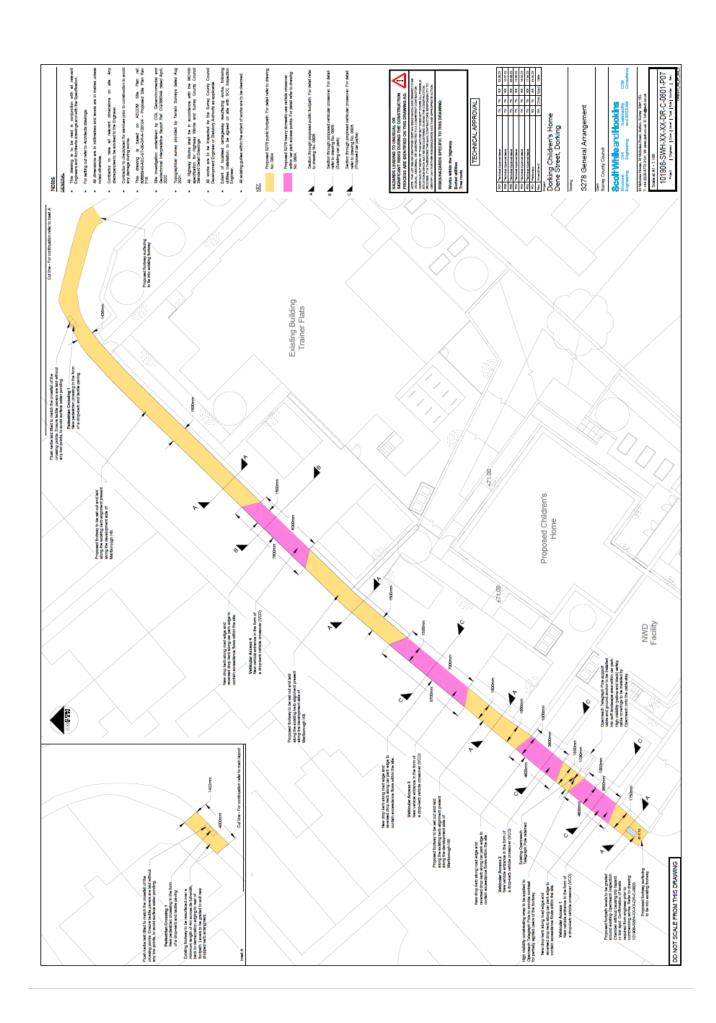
Construction layout with area to be appropriated Land to be appropriated shown in red.
